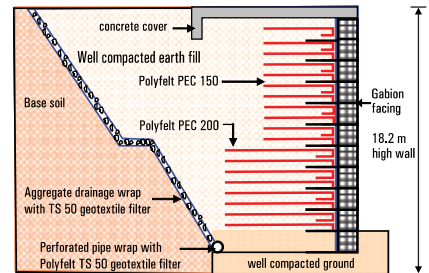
Cross section of vertical gabion faced dump wall with Polyfelt PEC reinforcement
